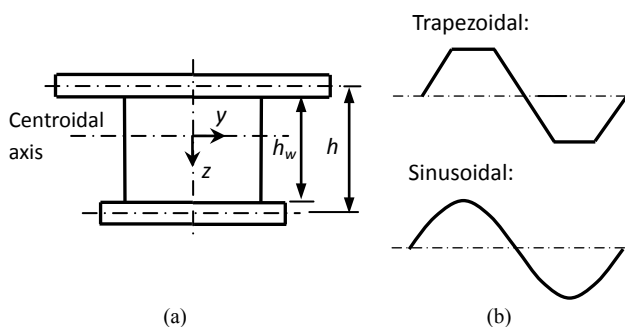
Configuration of bridge: (a) A simplified cross section; and (b) One full corrugation of steel web
